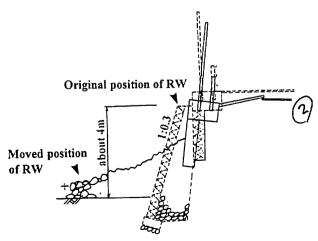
Typical damaged masonry RW; embankment on the north side along JR Tokaido Line between Setsu-Motoyama and Sumiyoshi Stations (Site MS1 in Fig. 2)
